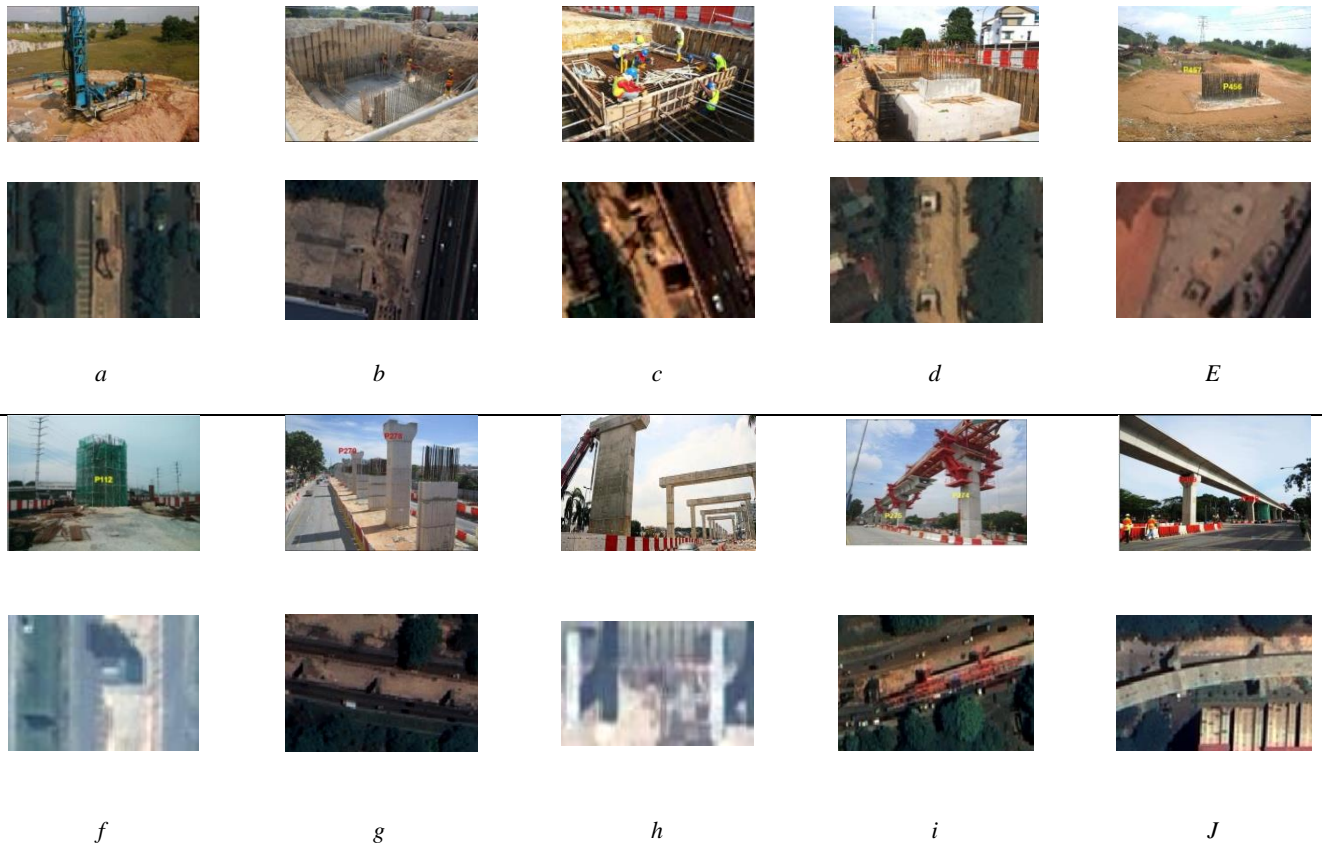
The ground base appearance of each construction stage with their optical image visual appearance a) Bore drilling works; b) Pile cap structures: earth excavation; c) Pile cap structures: formwork installation; d) Pile cap structures: concreting; e)) Pile cap structures: backfilling; f) Pier construction (ongoing); g) Pier construction (complete); h) Pier head construction; i) SBG launching (ongoing); j) SBG launching (completed)
